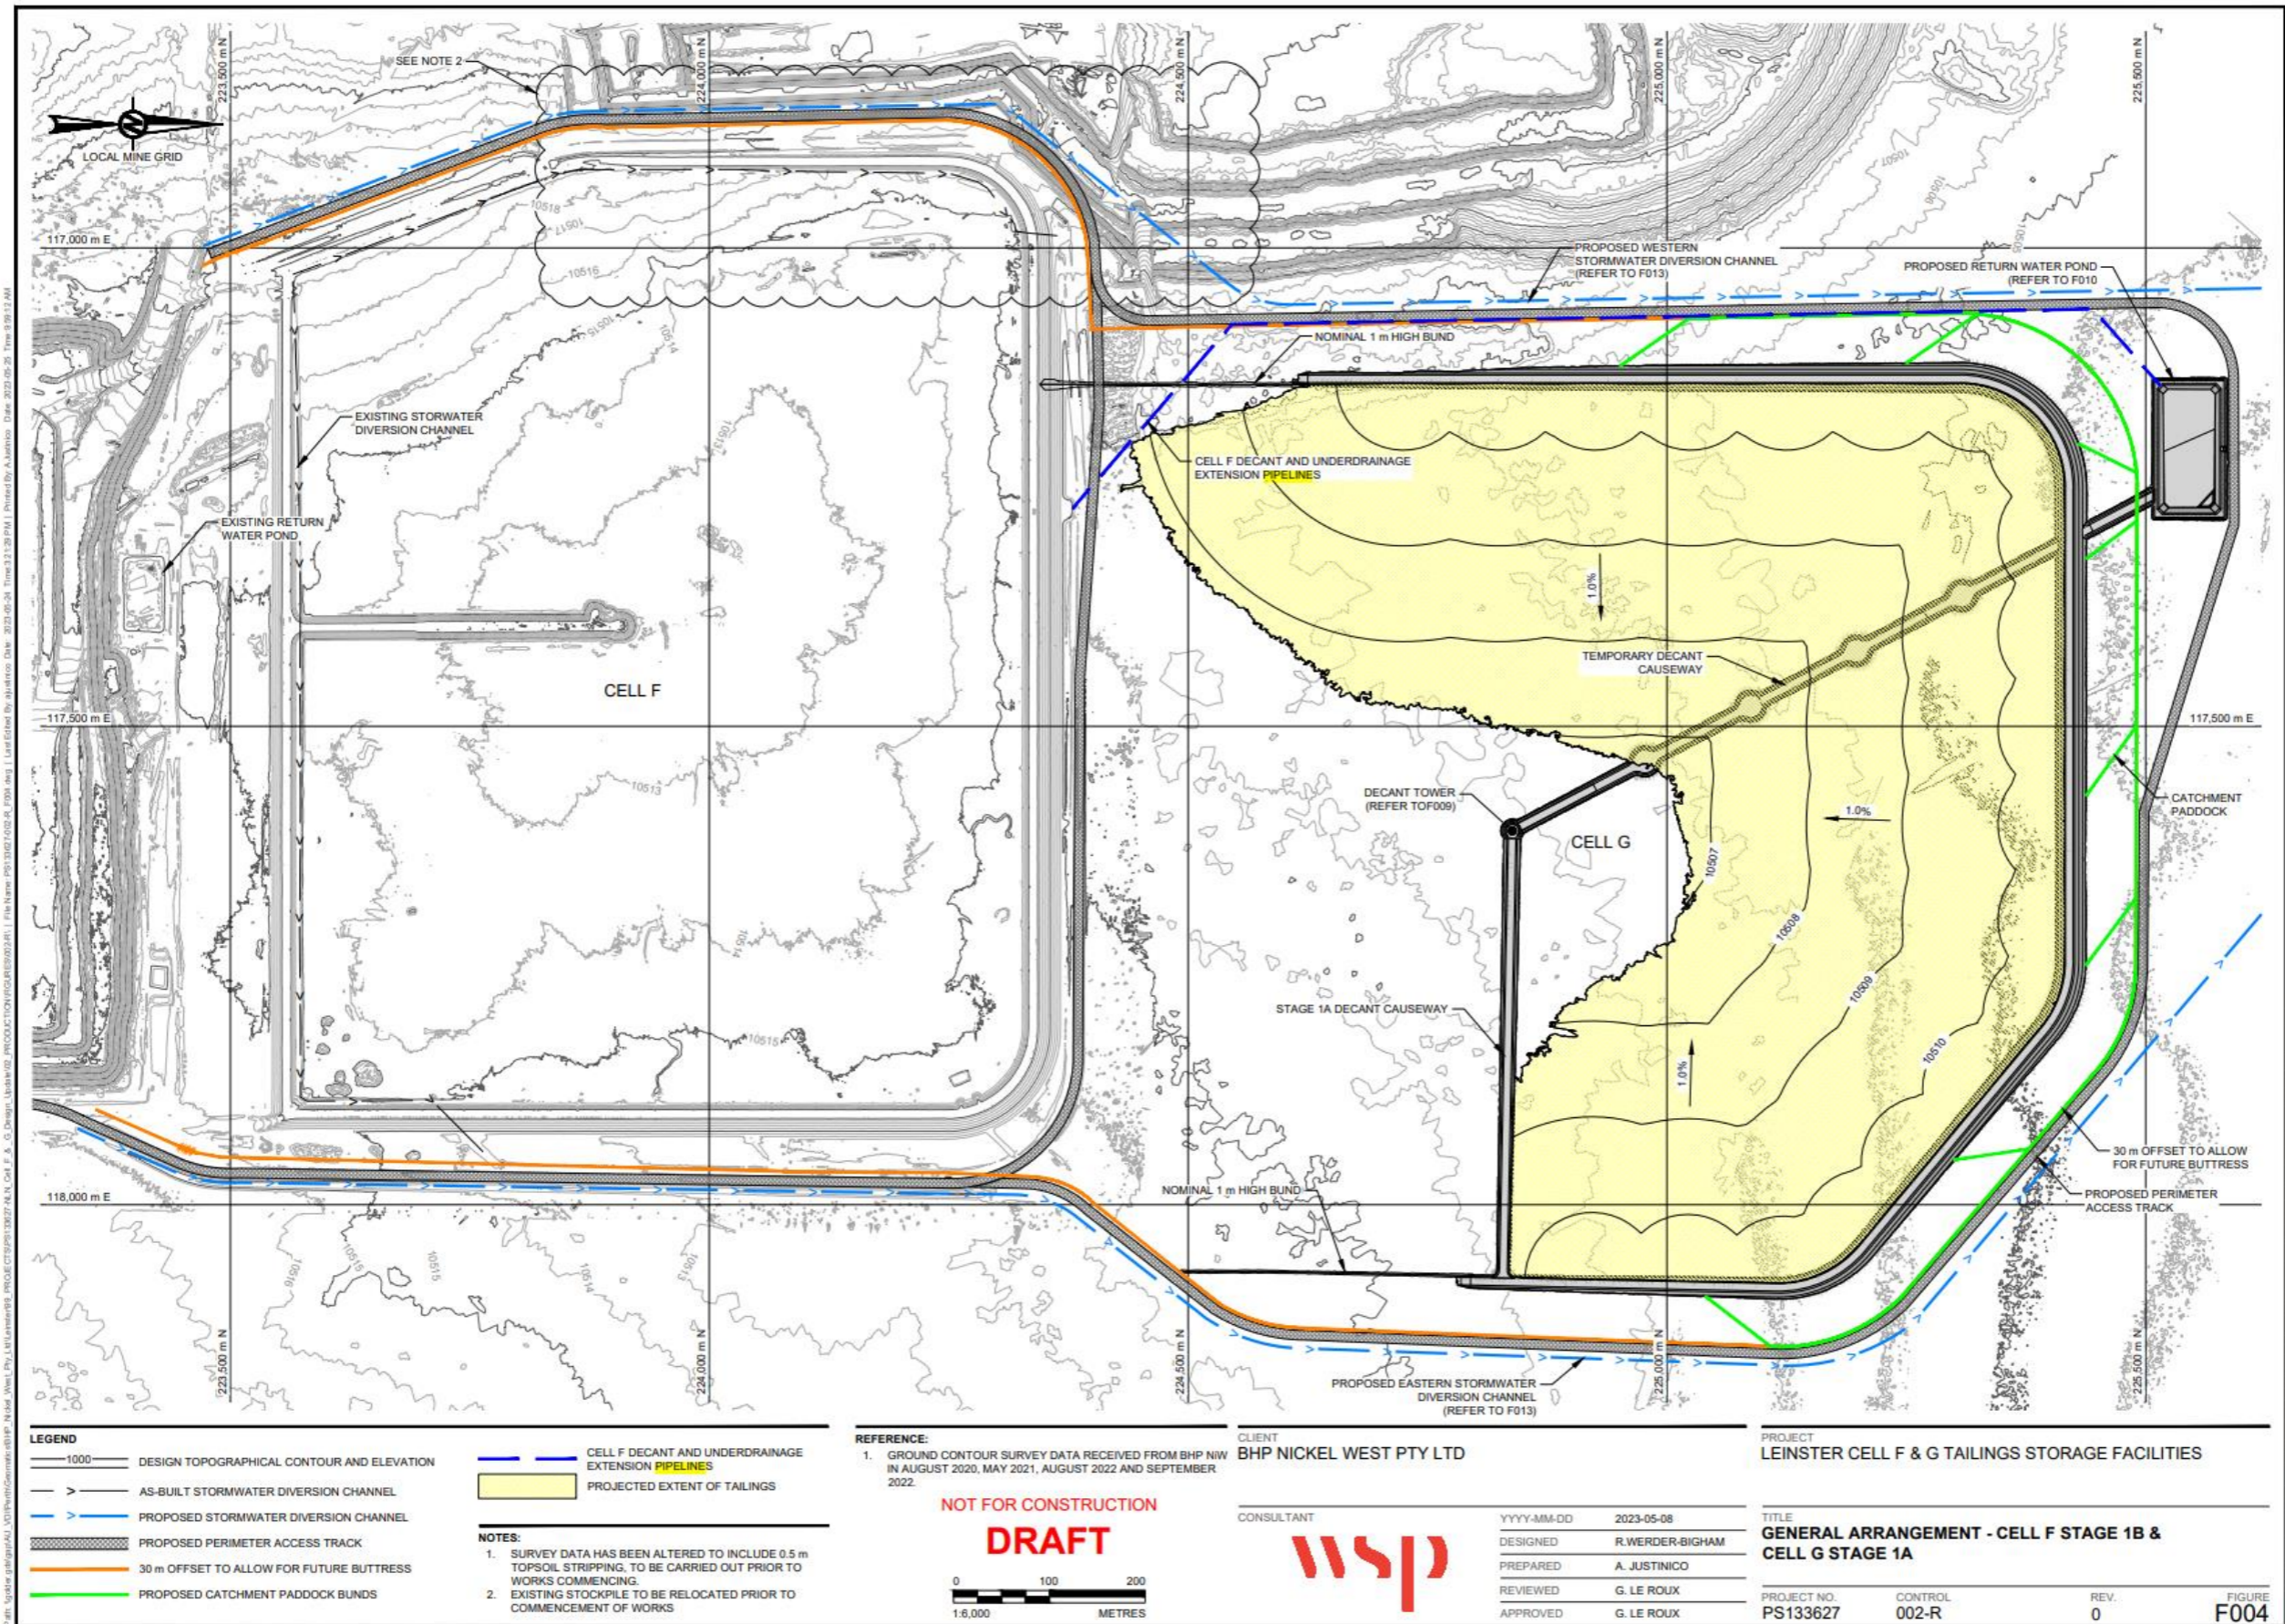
Tailings Storage Facilities Cell 3F (Stage 1B) and Cell 3G (Stage 1A) and Return Water Pond general layout.
